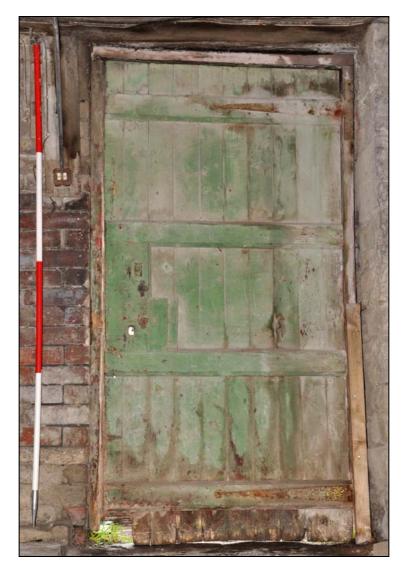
Building 2 - internal view of ground floor door in south-east elevation
